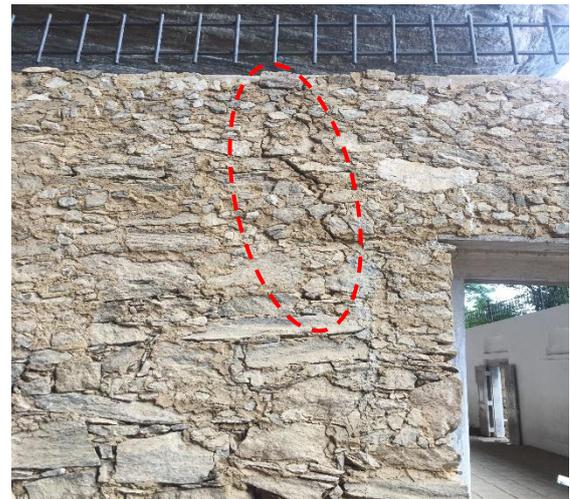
Cracks appeared in the wall of the shrine room of the historic Pahiyangala temple
